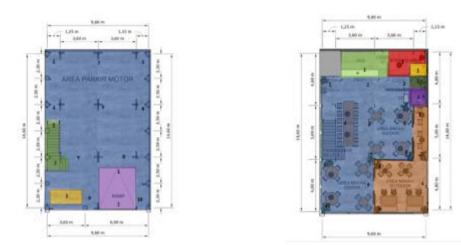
(left) Location of measurement point in first floor and (right) Location of measurement point in second floor
